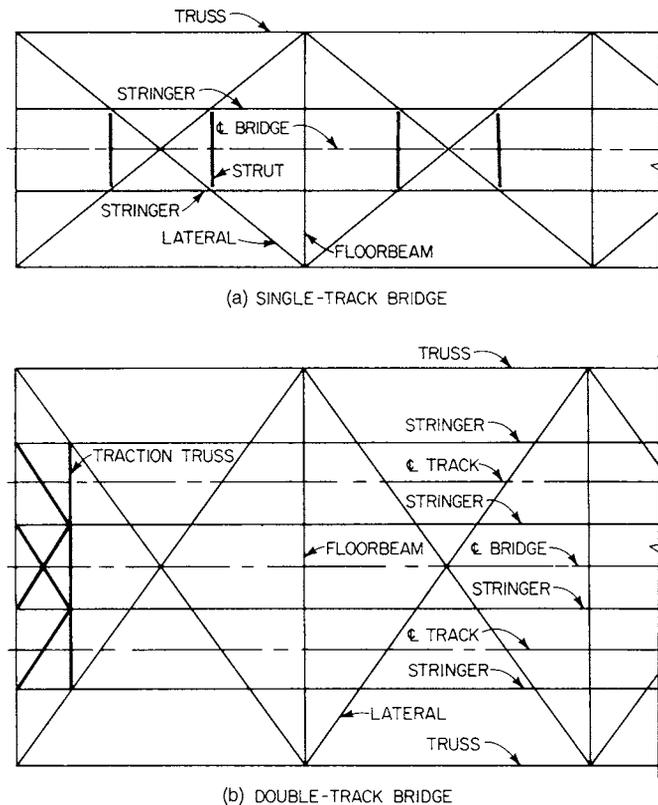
Lateral bracing and traction trusses for resisting longitudinal forces on a truss bridge.
